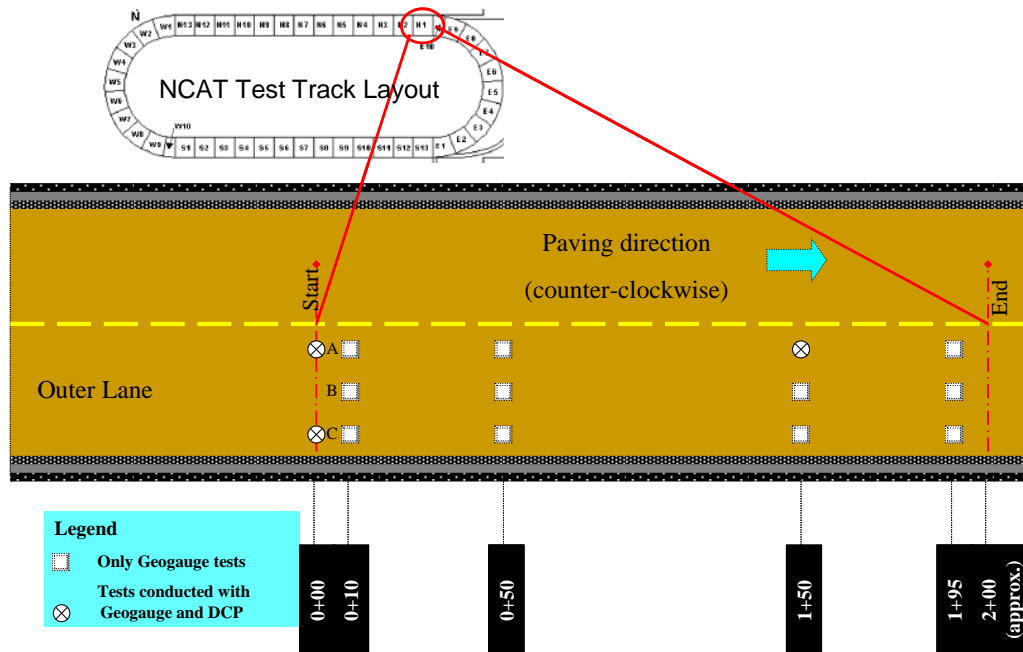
Layout of Test Points Along the Florida Limerock Base Placed in Section N-1 at the NCAT Test Track (refer to Tables B.14 and B.15)
